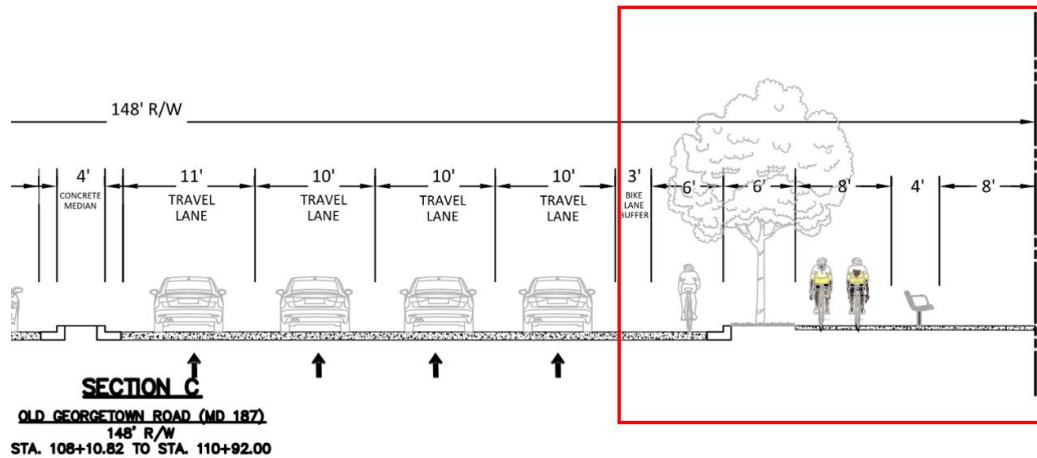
Old Georgetown Road with Subject Property Frontage Improvements Outlined in Red
